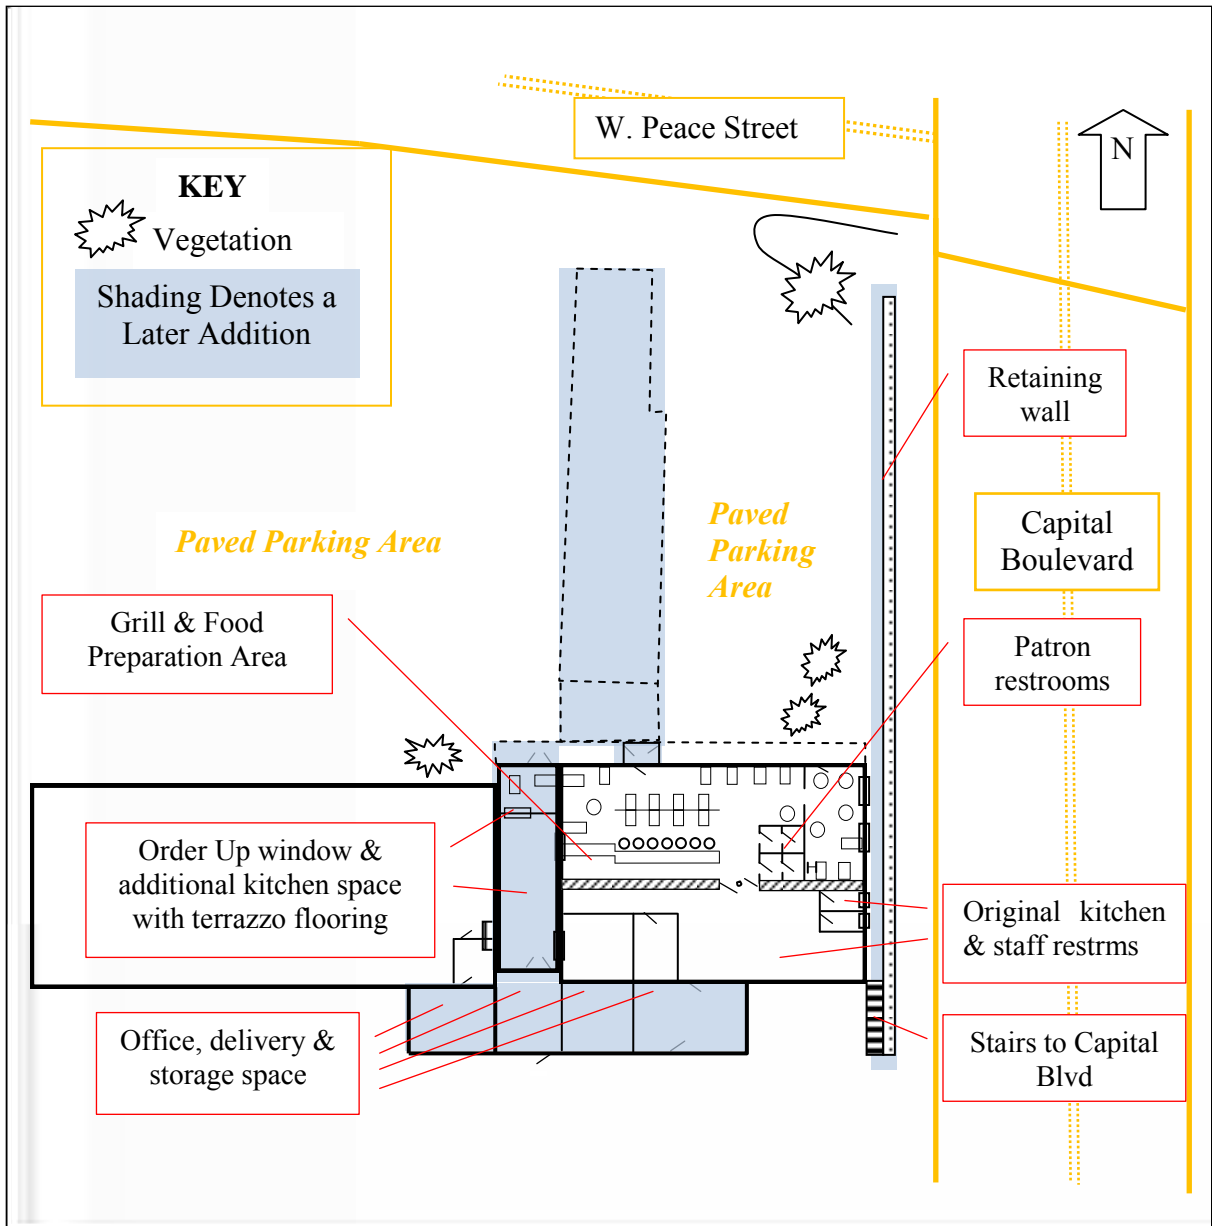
General Site Plan and Interior Arrangement at Finch’s Restaurant.
